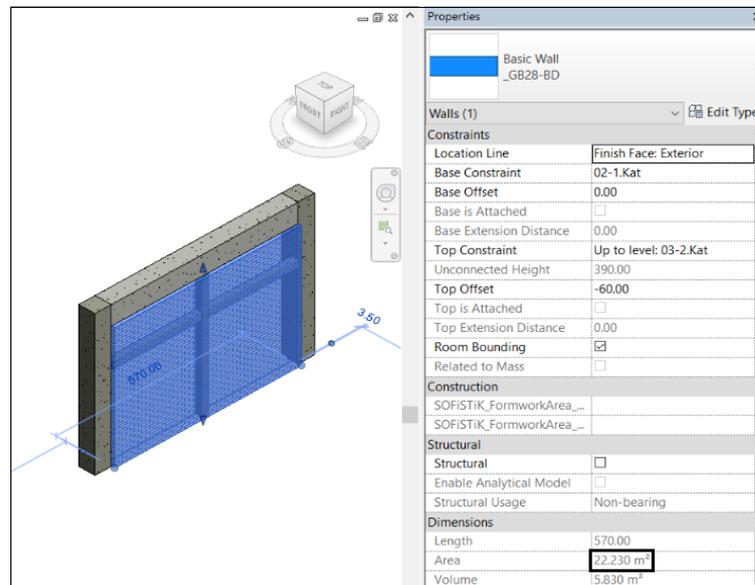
Area of an Architectural Wall (Exterior Face not Aligned with Structural Frame - after Using Join Feature of Revit)
